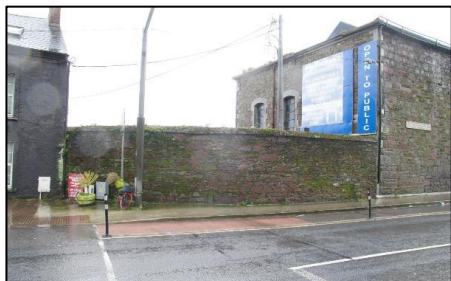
Existing Stone Wall at Lower Glanmire Road
